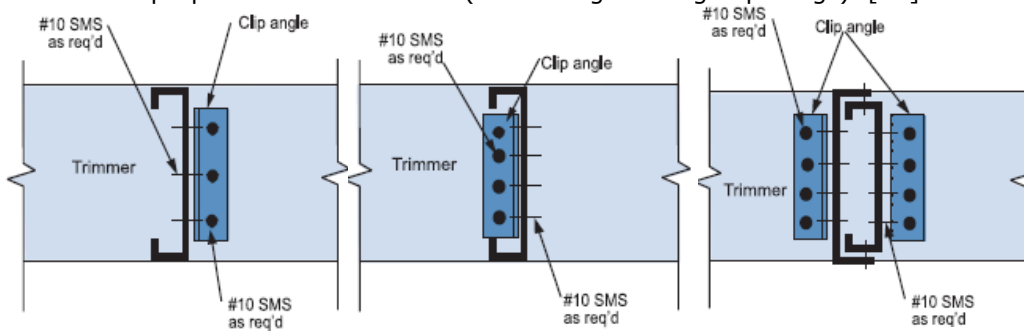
Header to Trimmer Connections for Floor Openings [40]
